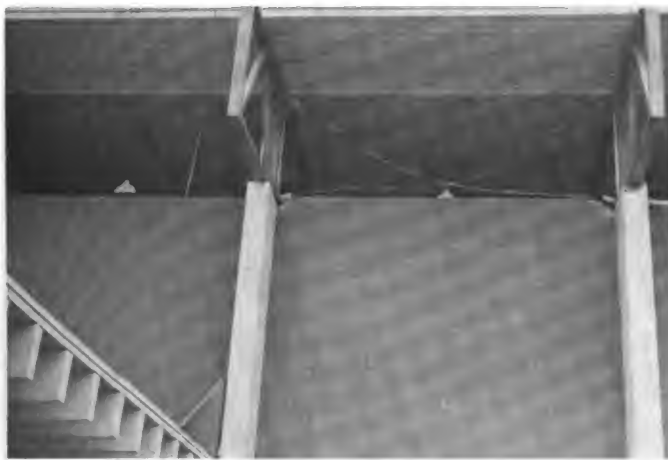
San Fernando Valley Juvenile Hall. Boys' school and gymnasium, west wall of gym. Failed rod bracing and cracks in concrete wall panel.
